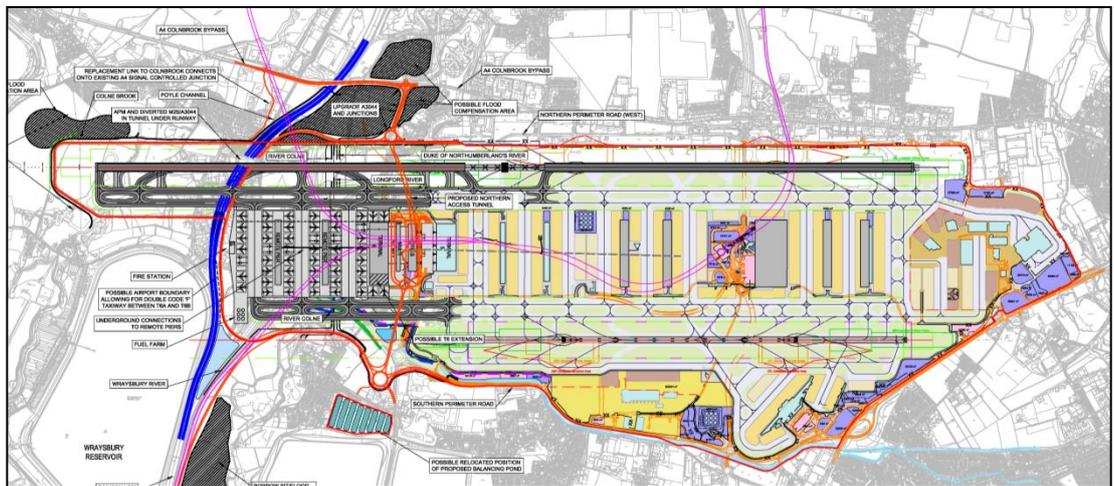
Heathrow Airport Extended Northern Runway Master Plan
